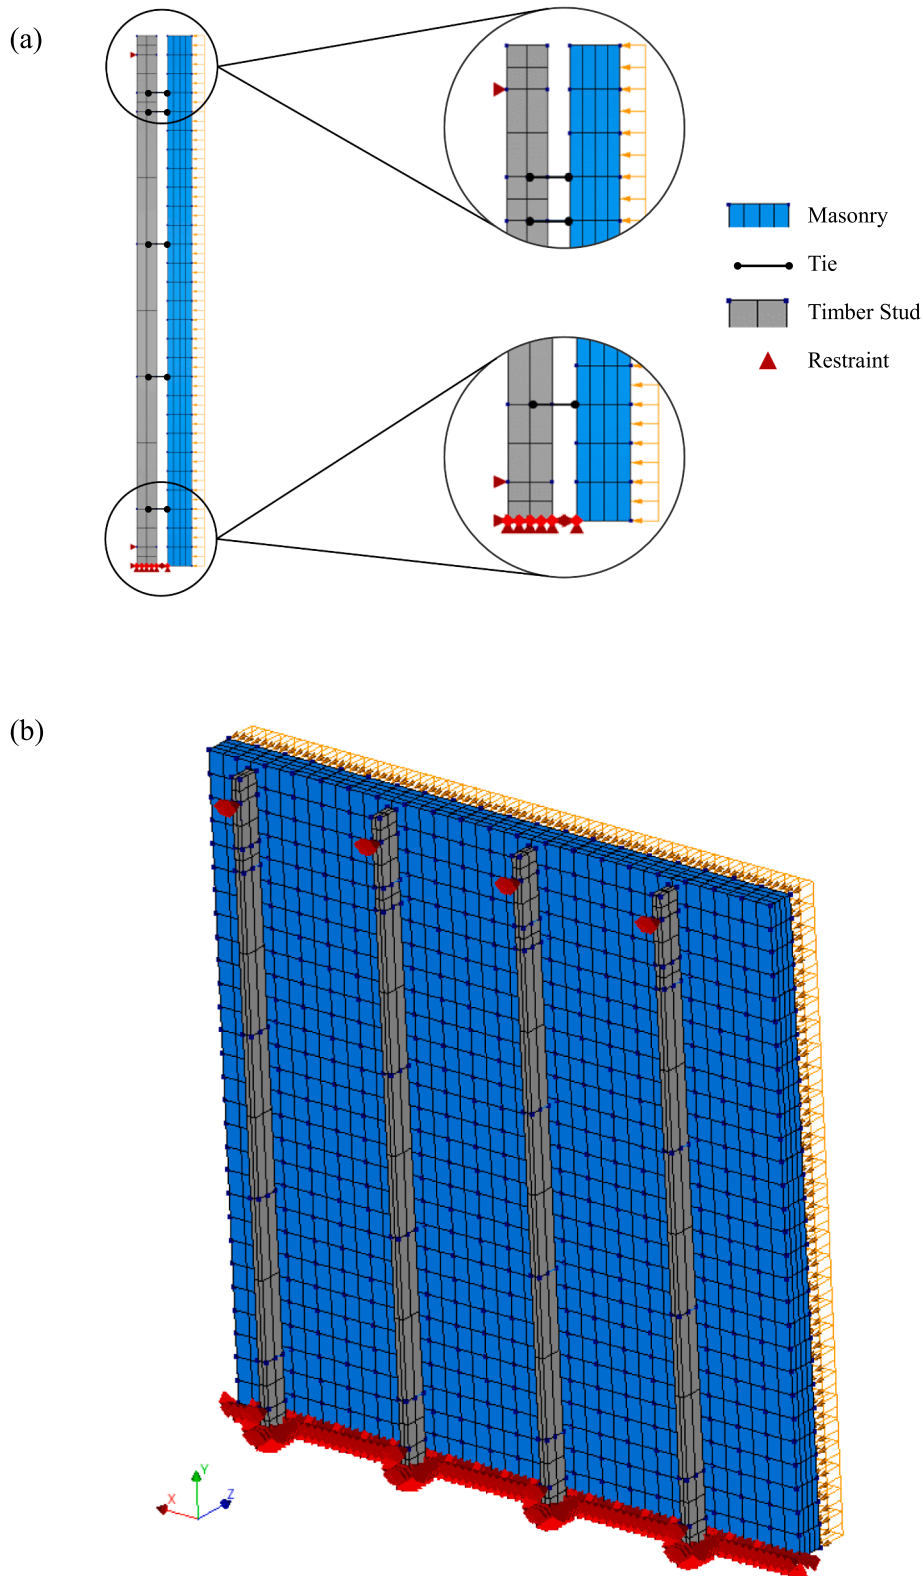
(a) Side view and (b) isometric view of the veneer wall system FEA model (inward loading).
